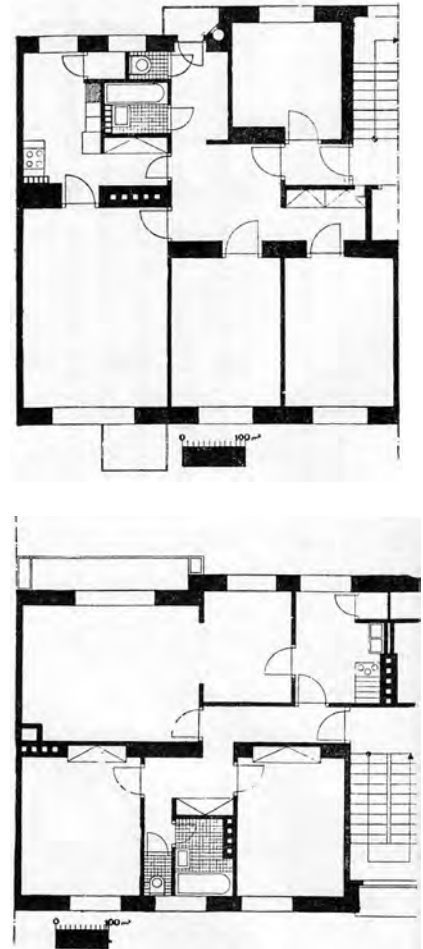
JIŘÍ ŠTURSA AND OTTO SLABÝ, PLANS OF TWO-YEAR PLAN APARTMENTS.
